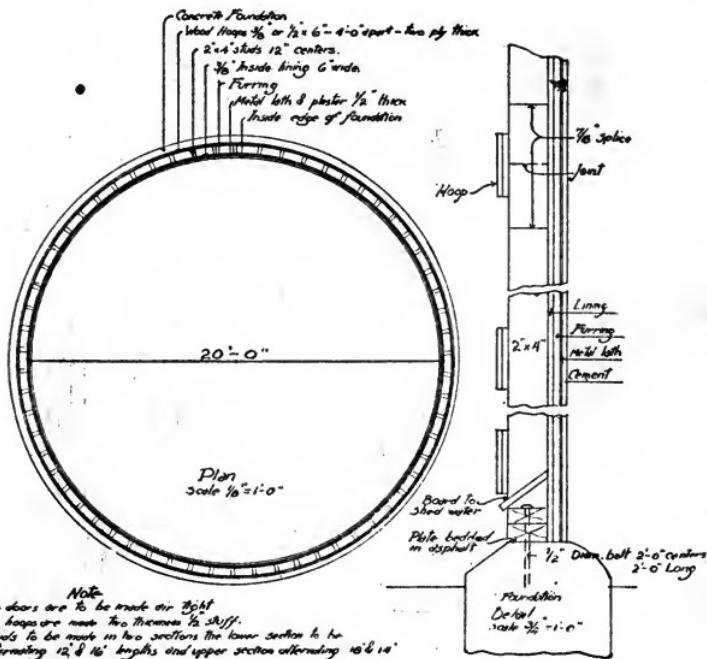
Foundation plan and section of plastered round wooden silo.
